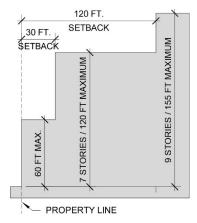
SECTION AT MT. VERNON AVENUE NORTH
